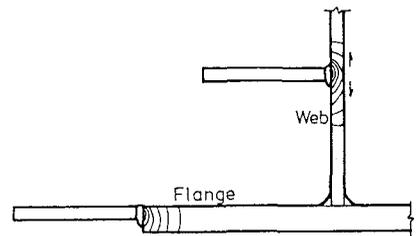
Difference of Crack Propagation Behavior of Gussets welded to Flange or Web.
